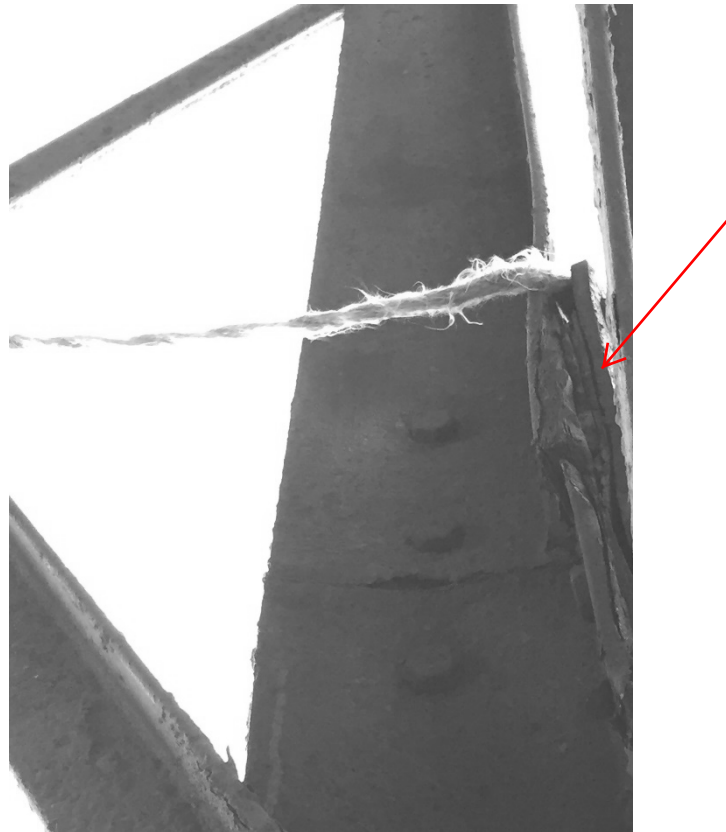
View of condition of splice plates at previously repaired column damage.
